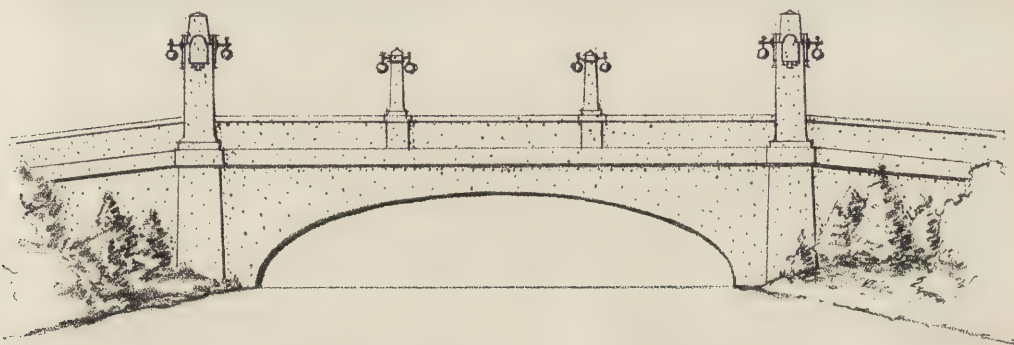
SUGGESTED DESIGN FOR A CONCRETE BRIDGE.
